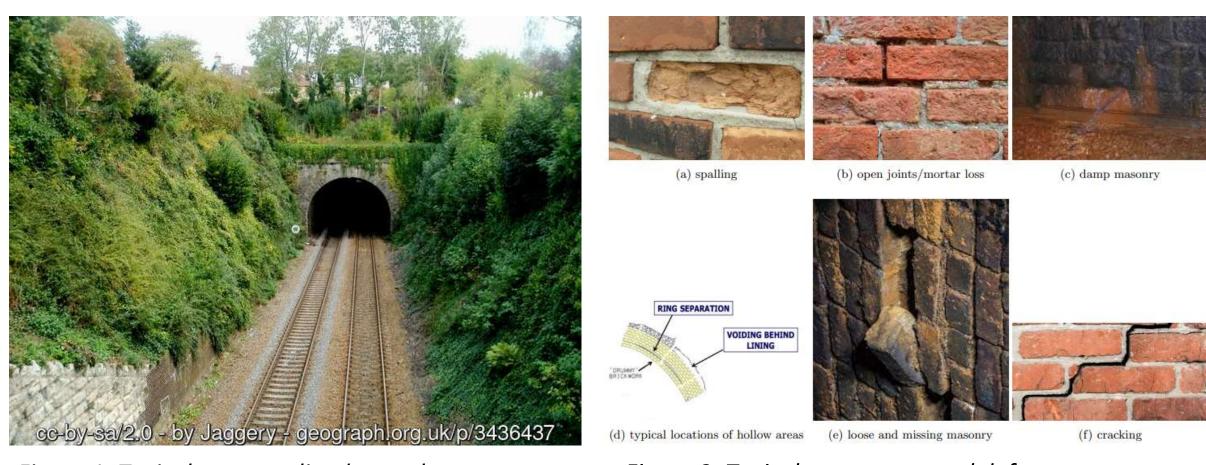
Typical masonry lined tunnel entrance Figure 2: Typical masonry tunnel defects
